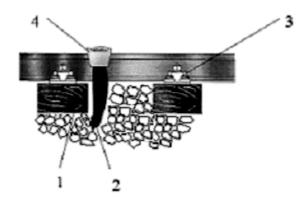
The basic scheme for the tamping operation of the sleeper: 1 – the sleeper; 2 – the tamping tool; 3 – fixed spare parts; 4 - port tool [1]
